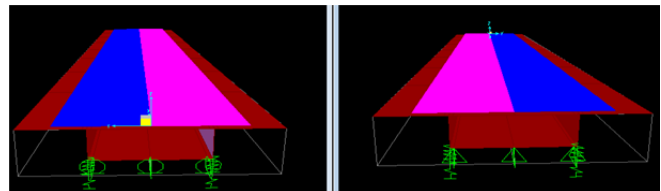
Rectangular box girder model for span 40m and girder depth of 1.8m
